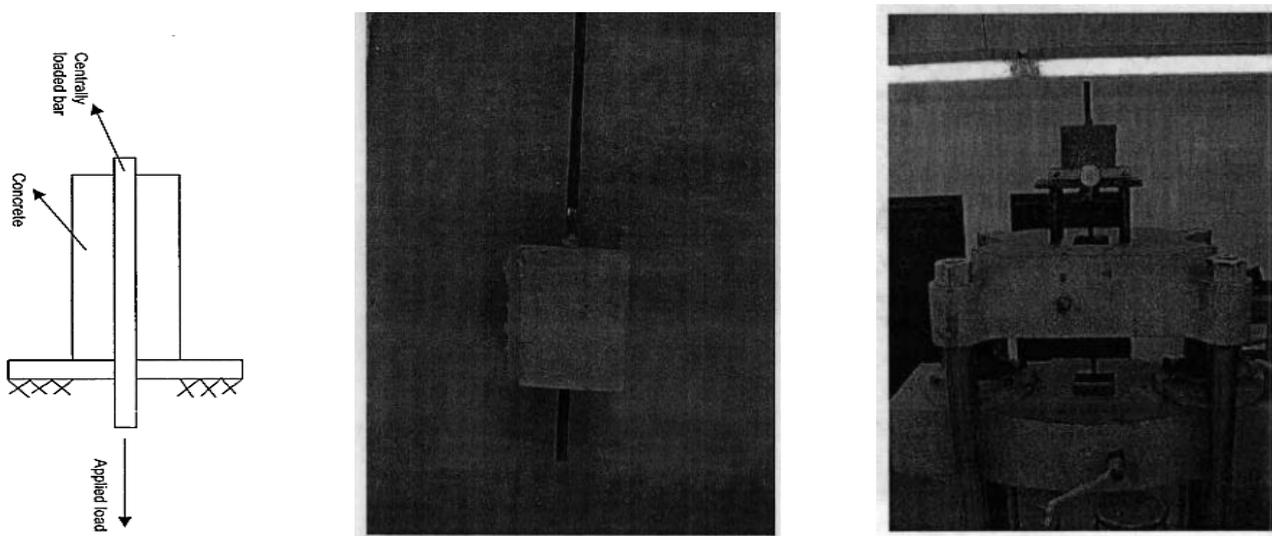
The bond failure of the plain basalt rebar reinforced specimen due to slip[34]
